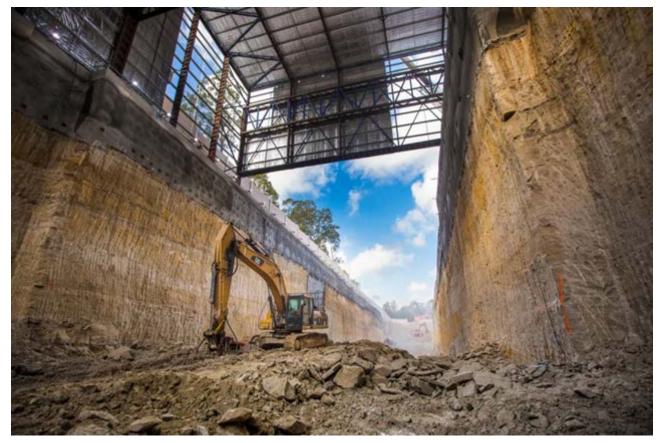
Spoil and Excavation Works at the Showground Station Site
